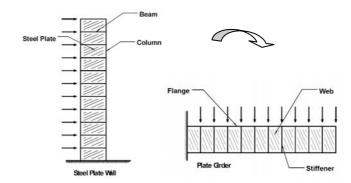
Similarity between steel plate shear wall and cantilever plate girder
